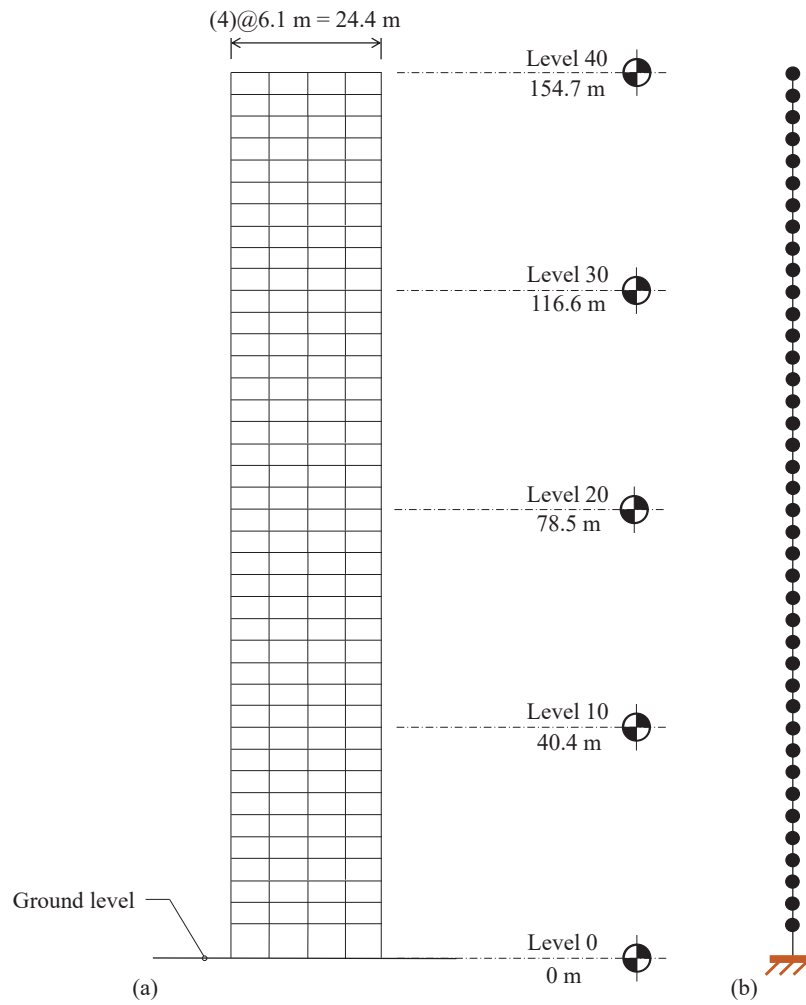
Case study steel frame: (a) schematic of the frame layout; (b) shear building idealization.
